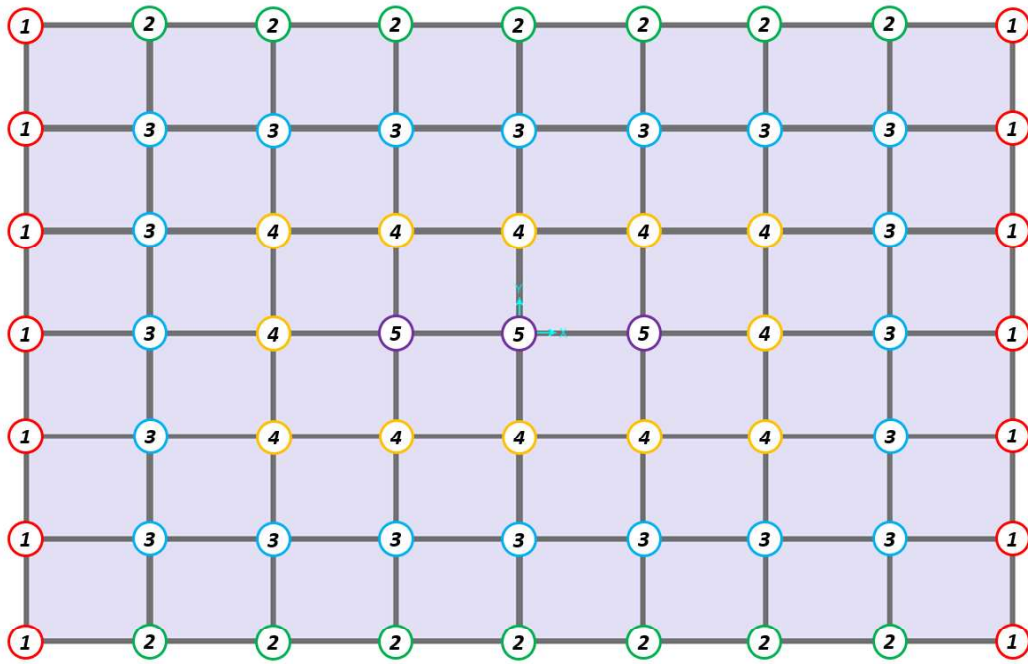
Column grouping of the 20-story steel structure with 3860 members.
